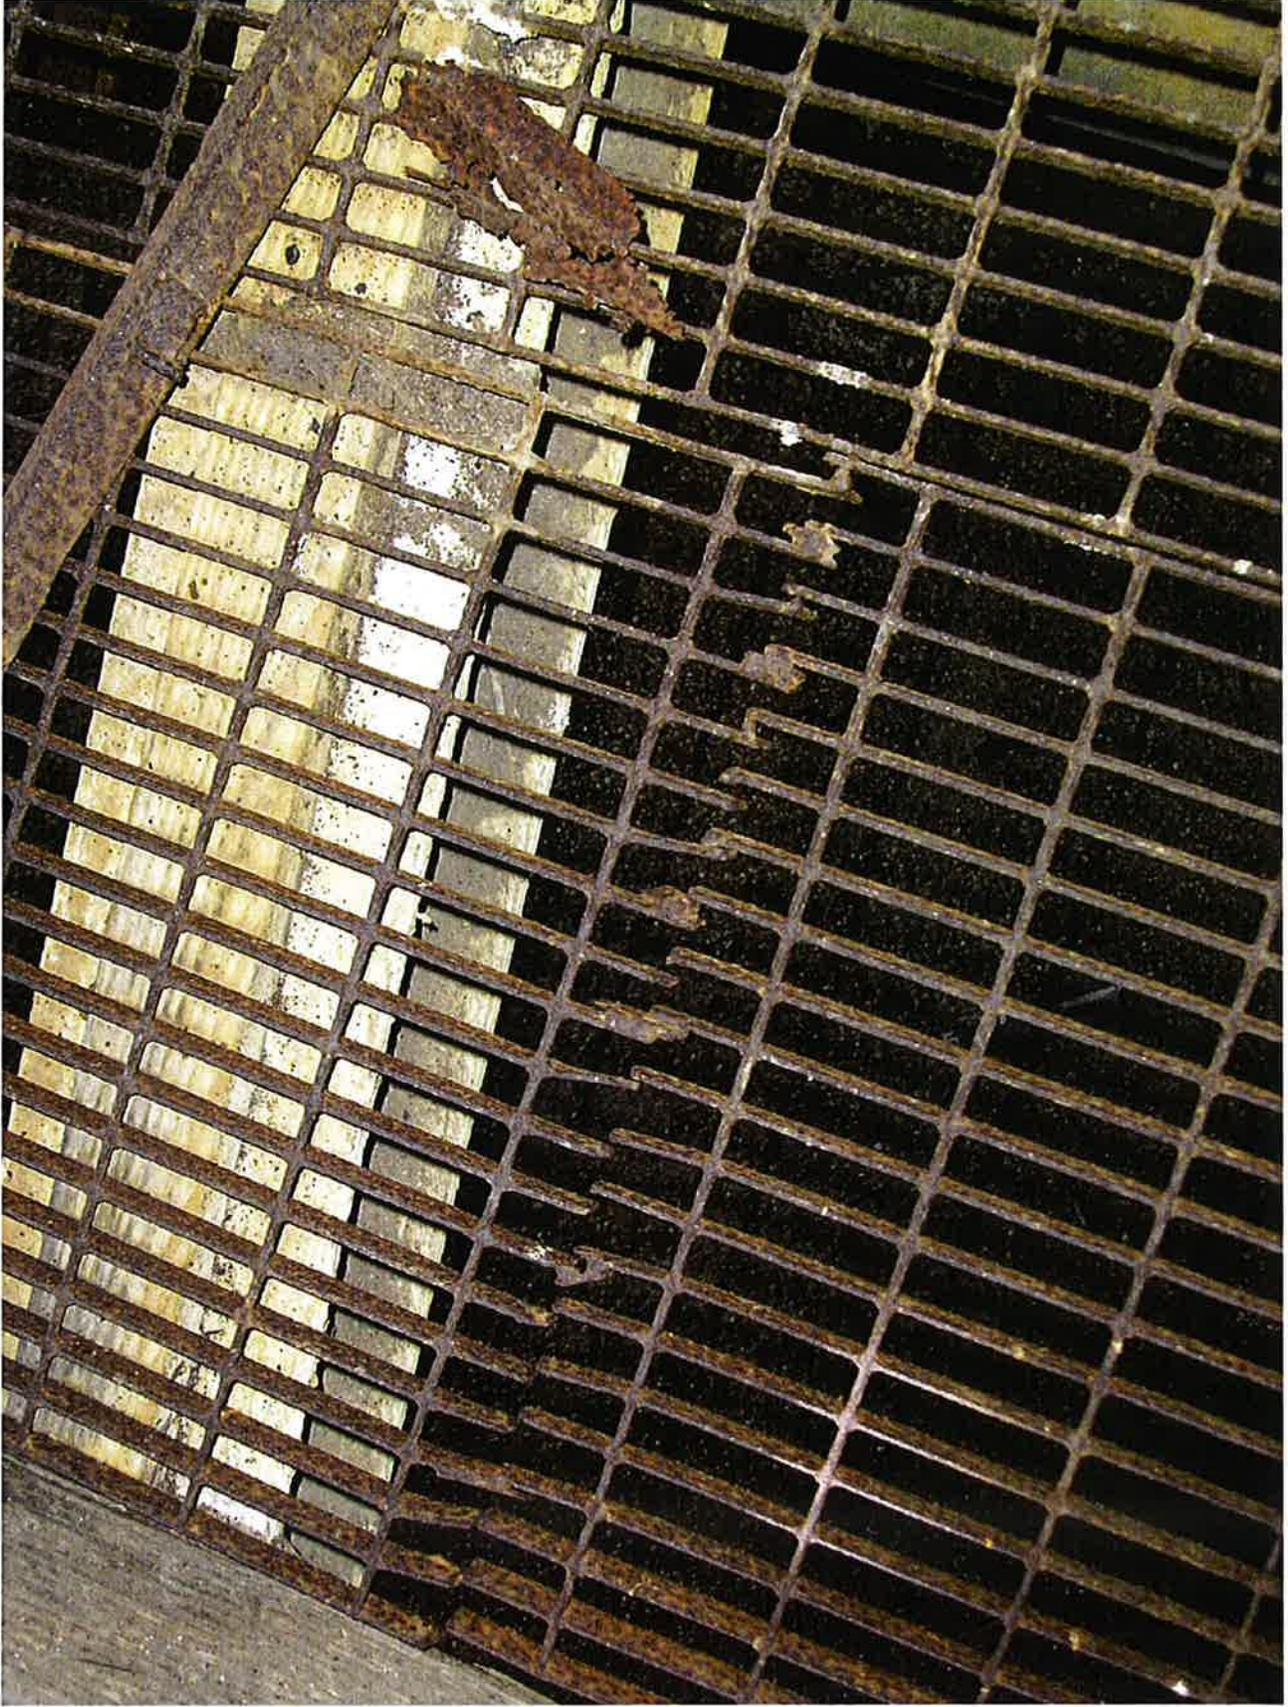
VIEW OF GRATING AT SECOND LEVEL OF CATWALK AT WEST SIDE OF BUILDING 26
